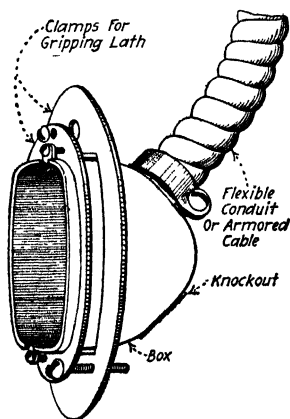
No. 11 Rim-clamp outlet box for wall Elexit outlets in completed buildings.
